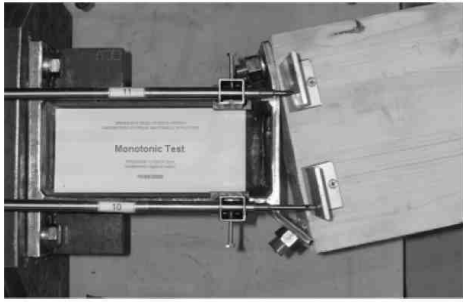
Detail of a timber to steel semi-rigid connection with glued-in rods
